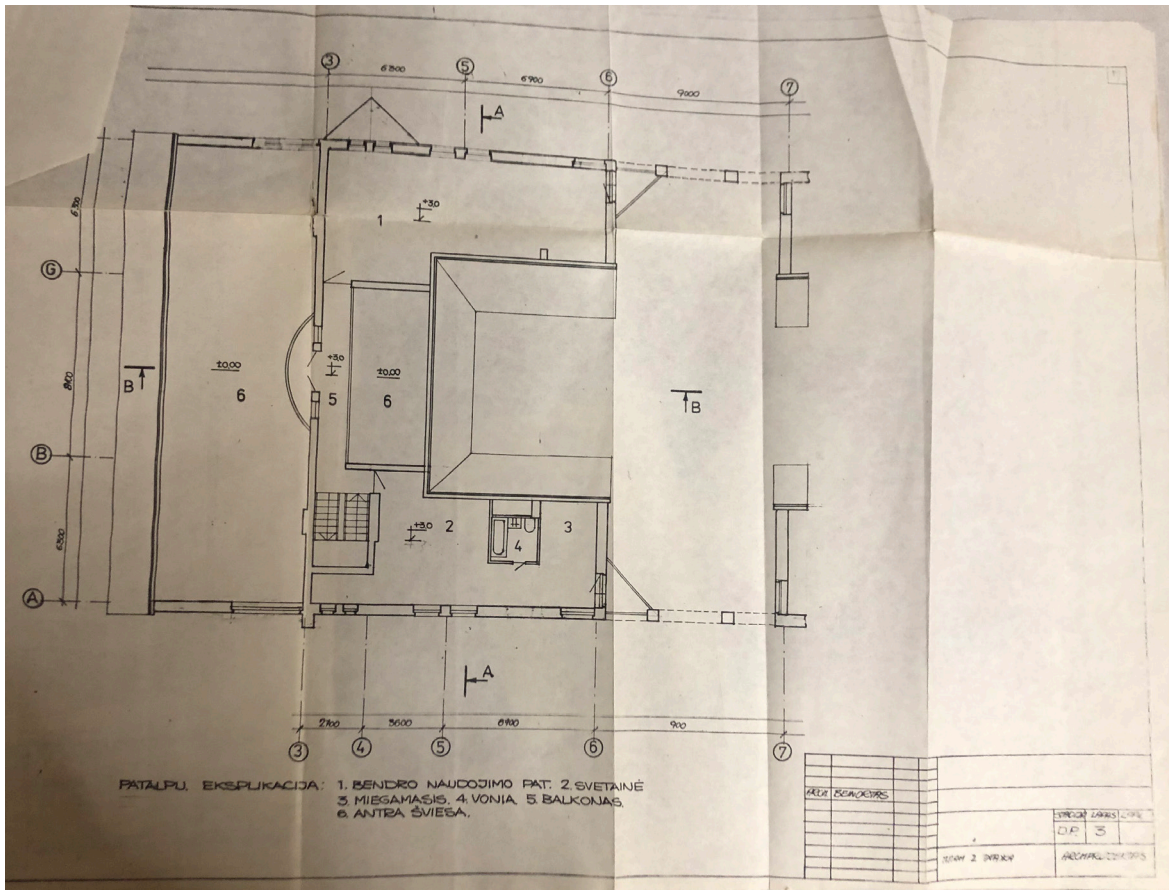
First floor plan of Visaginas St. Paul Church. Author Raamūnas Beinortas, 1990.
